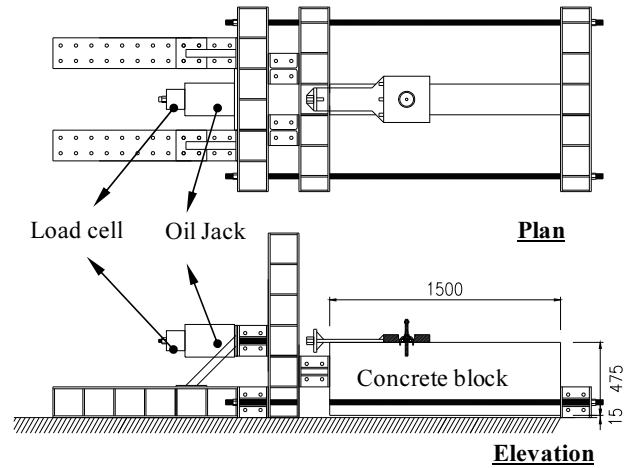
Test set-up of shear test¹⁰⁾ (unit: mm)
